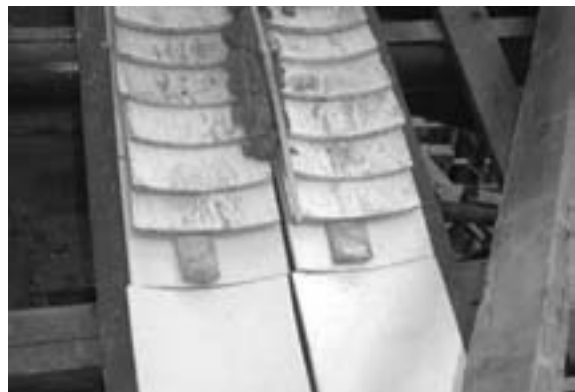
Traditional Lingnan technique of adding bamboo strips as reinforcements was introduced
